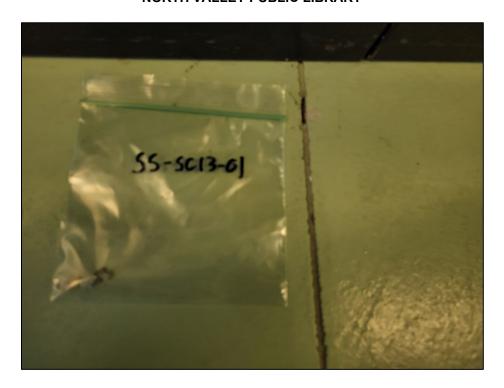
SC13: Silicone in kitchen / staff break room flooring
